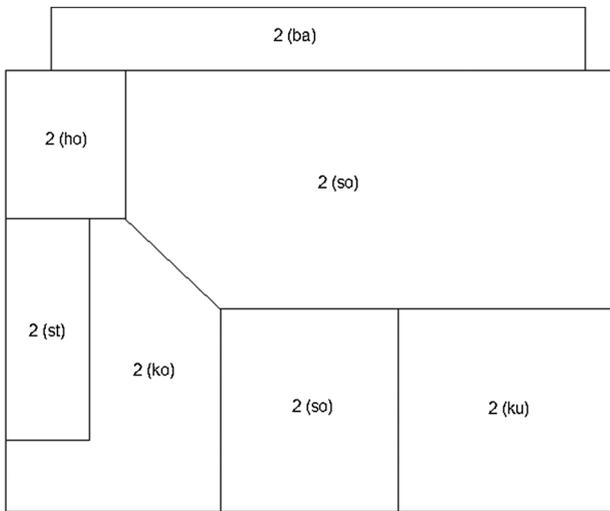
Raster floor plan from Slovenian Building Cadastre following the thin-wall concept - the room annotations consist of building part number and room usage code in brackets.
